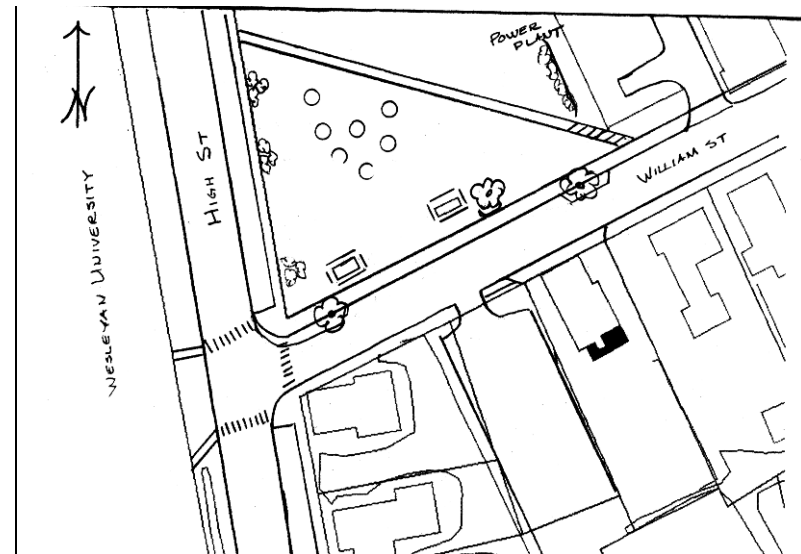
A Concept Plan for the Power Plant with seating, lower profile plantings, map and art panels to screen utility boxes and street trees in bump-outs.
